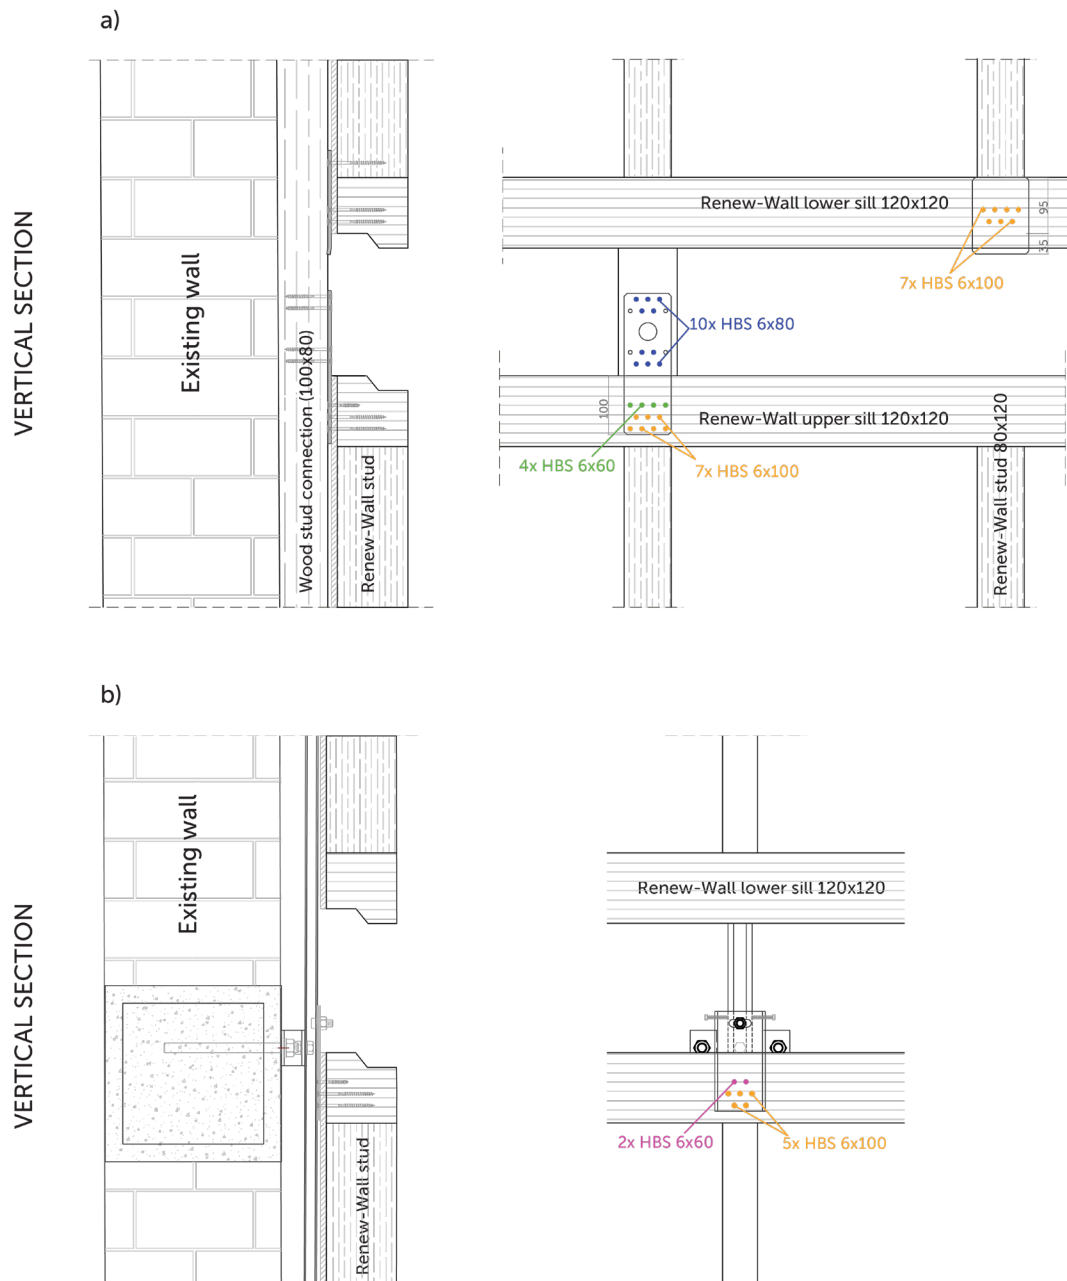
Renew-Wall structural connection to the existing wall: a) wood-wood solution; b) Halfen-type solution.
